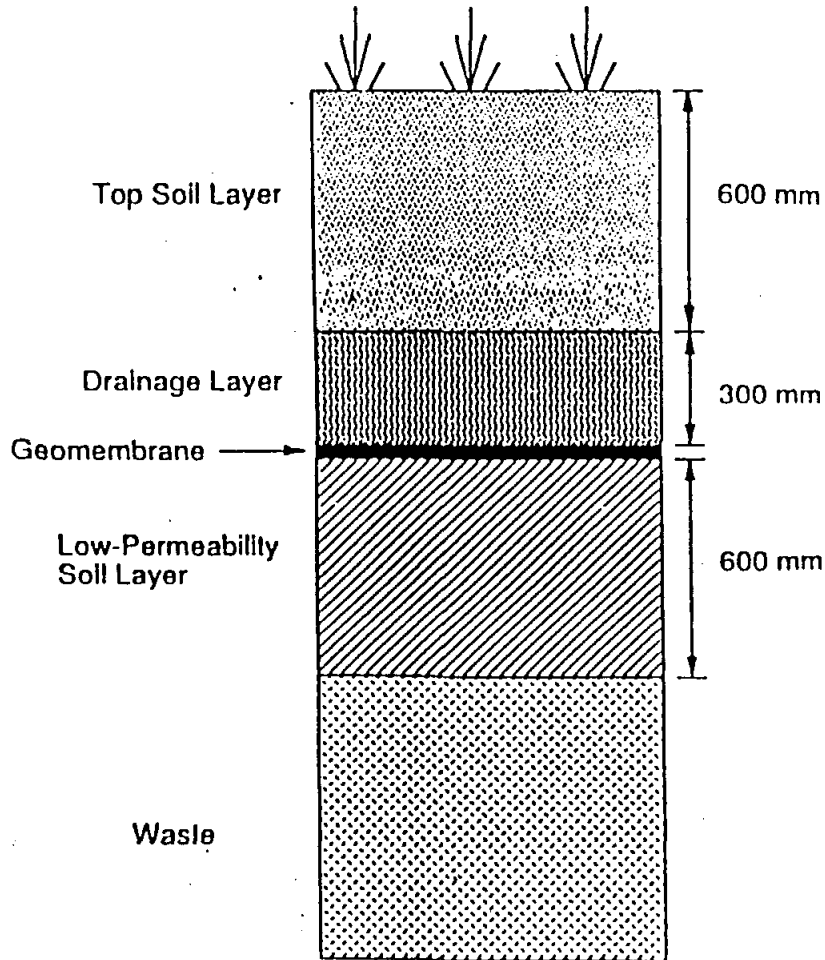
Recommended surface barrier for hazardous-waste disposal facility (after USEPA, 1989).
